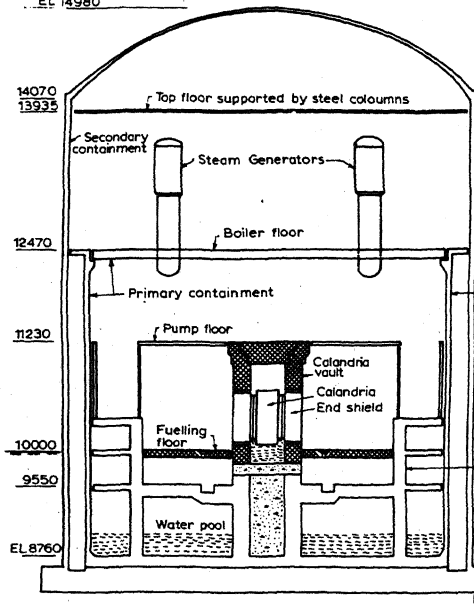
SECTIONAL ELEVATION OF ORIGINAL STRUCTURE ABOUT XX
